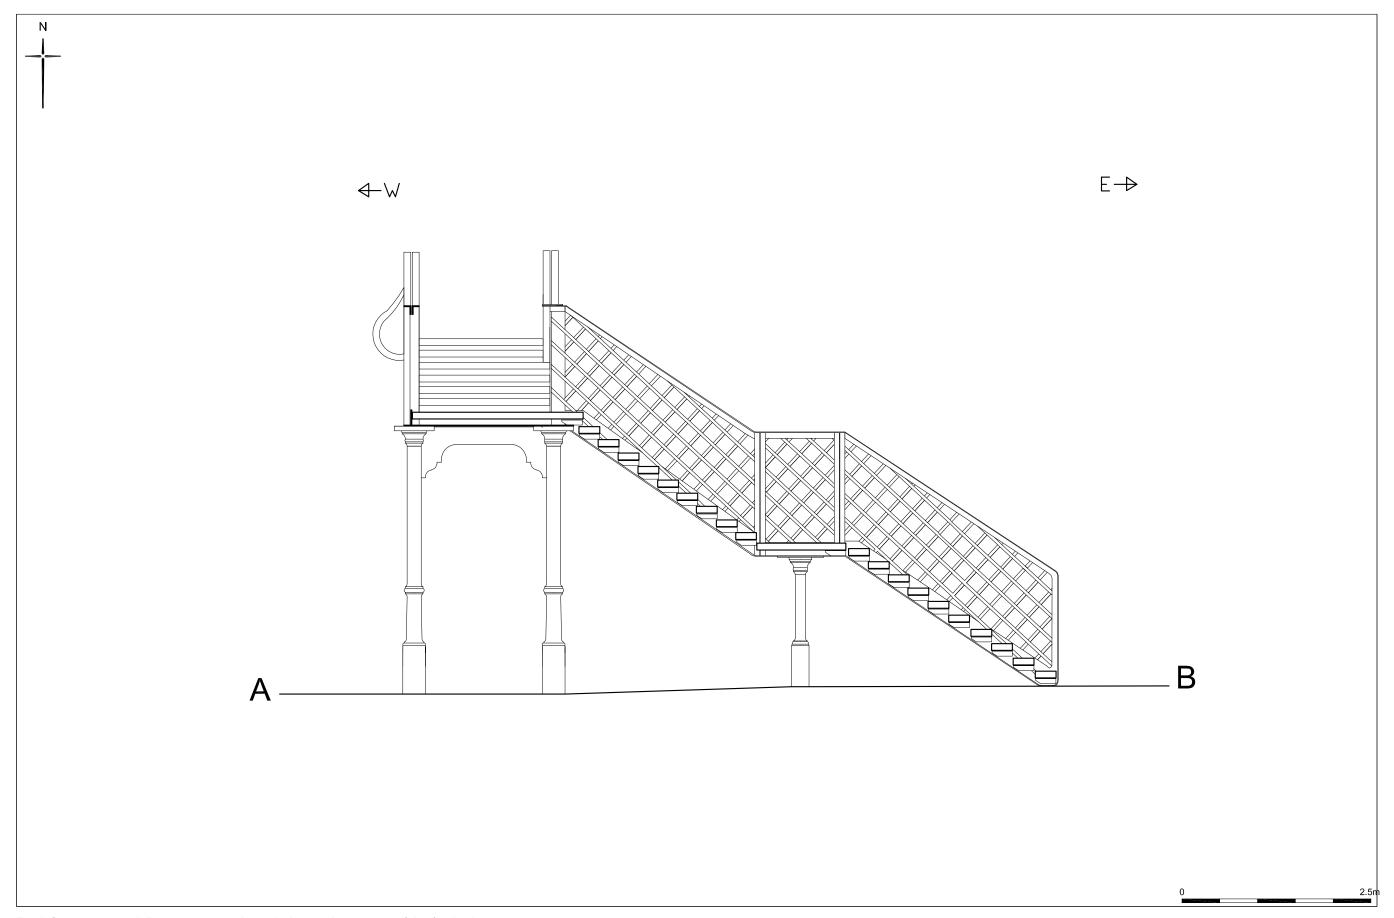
Cross section A-B, west to east through the southern steps of the footbridge
